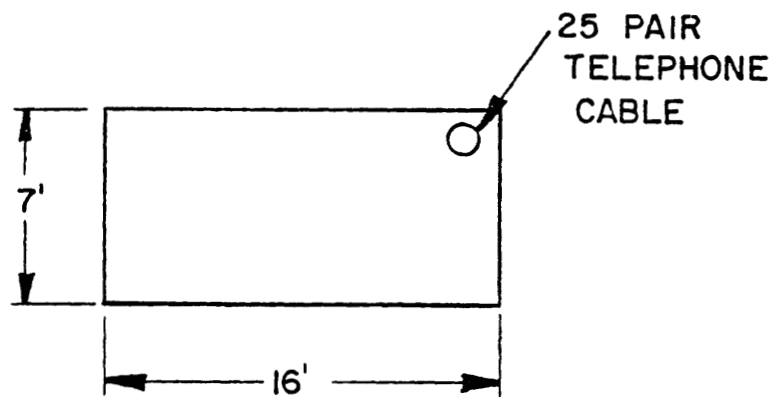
CROSS SECTION OF MANWAY (LOOKING INBY)
